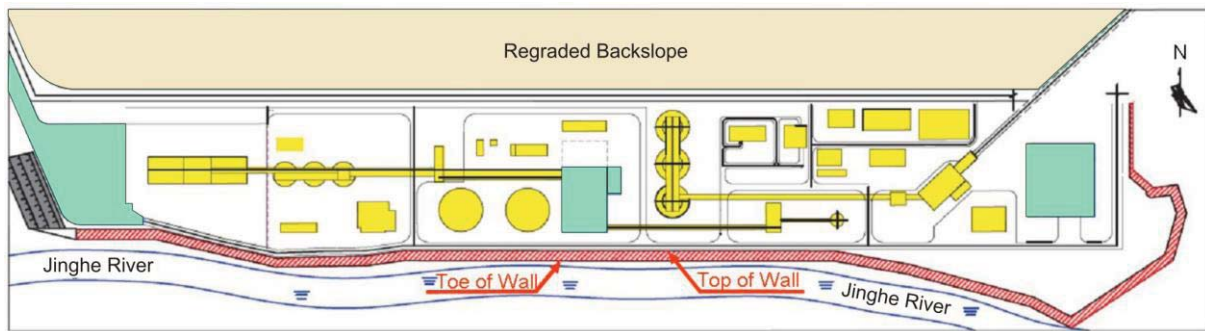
Layout plan of Hetaoyu coal processing plant and location of reinforced soil wall
